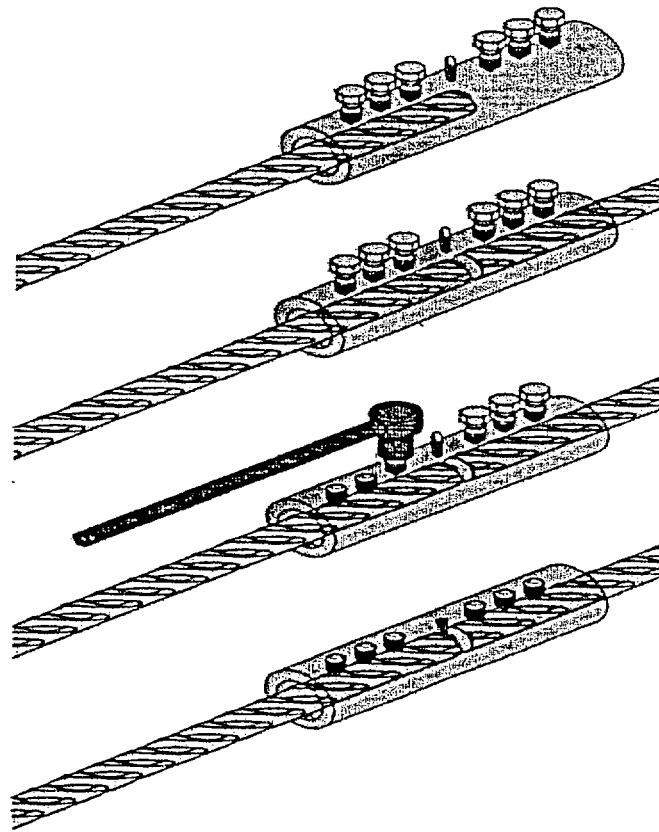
Bar-Lock Coupler Cutaway
